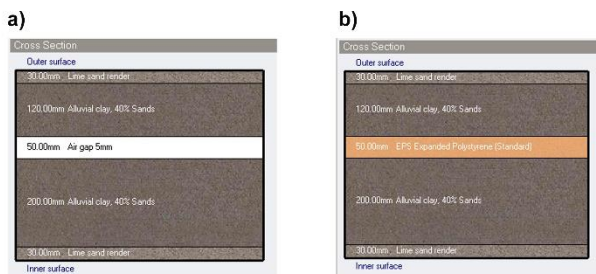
Proposed double wall layers: a) double wall with air-gap, b) double wall with polystyrene.
